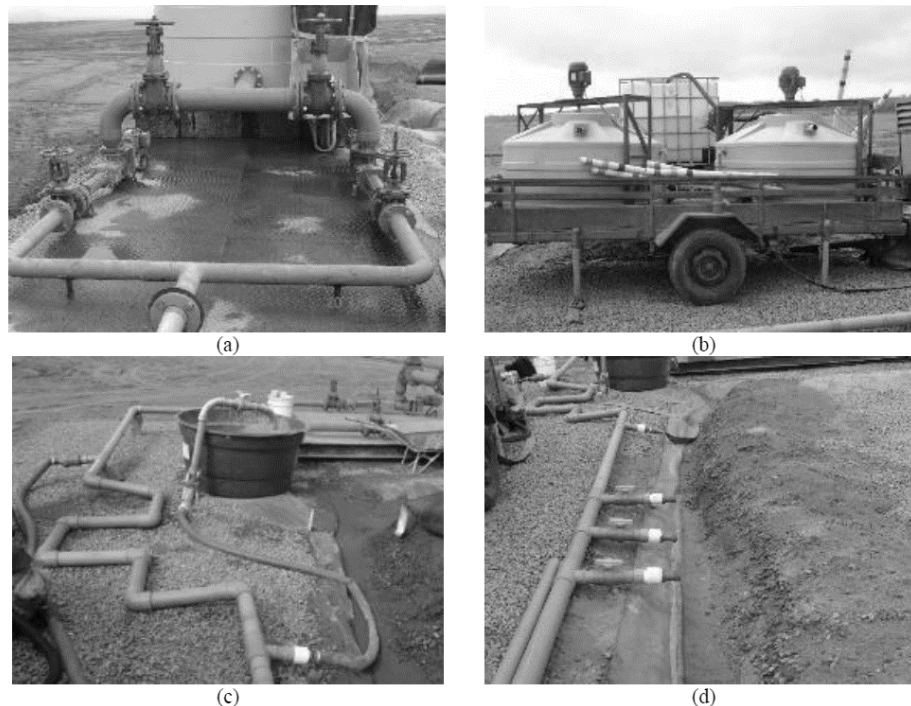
(a) pumping system composed of two pumps and a tank to store tailings; (b) two polymer tanks; (c) verification box and pipes to mixture tailings and the flocculating polymer; (d) pipes and connections to fill the geotextile tubes
